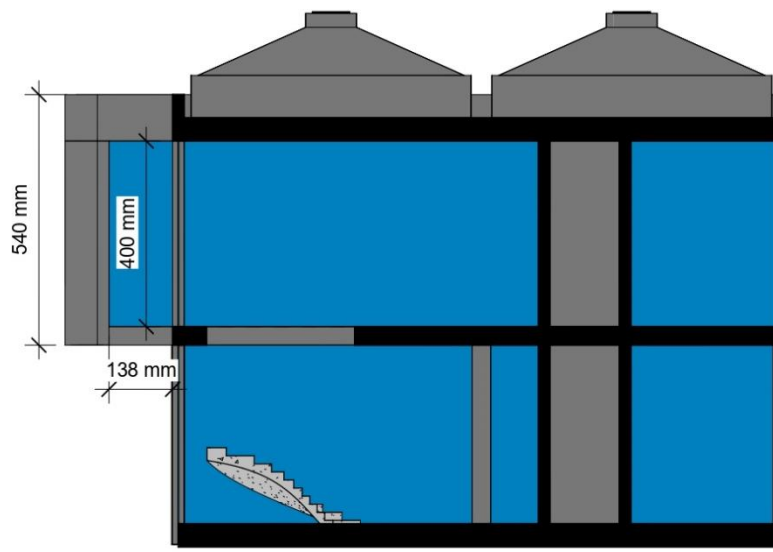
North facade drawing of the south section of METU Cafeteria Building
